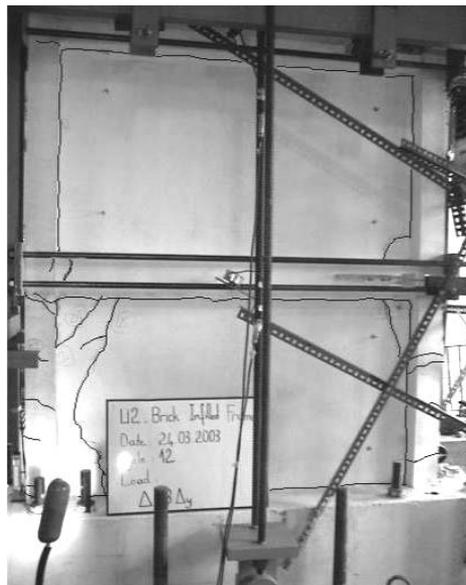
Crack Propagation on Specimen U2 at Load Cycle 12
